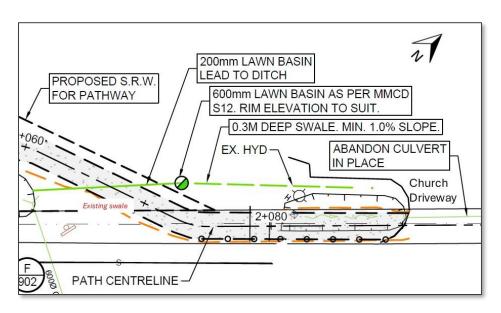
Site Proposed Project scope adjacent to the Courtenay Fellowship Baptist Church property including pathway construction in an existing swale
